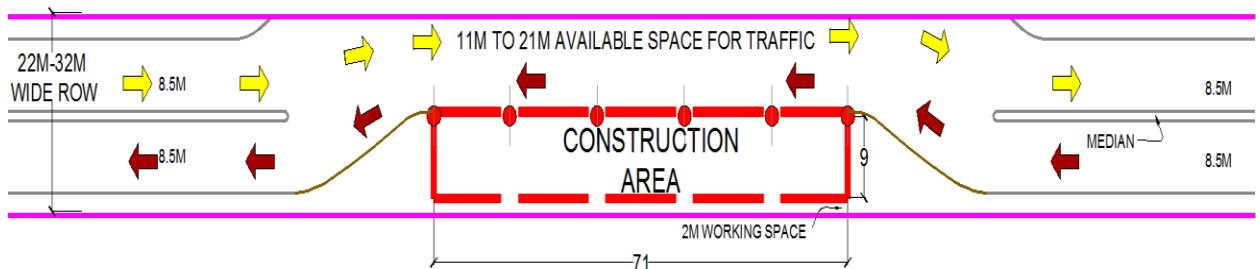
TYPICAL TRAFFIC DIVERSION PLAN
